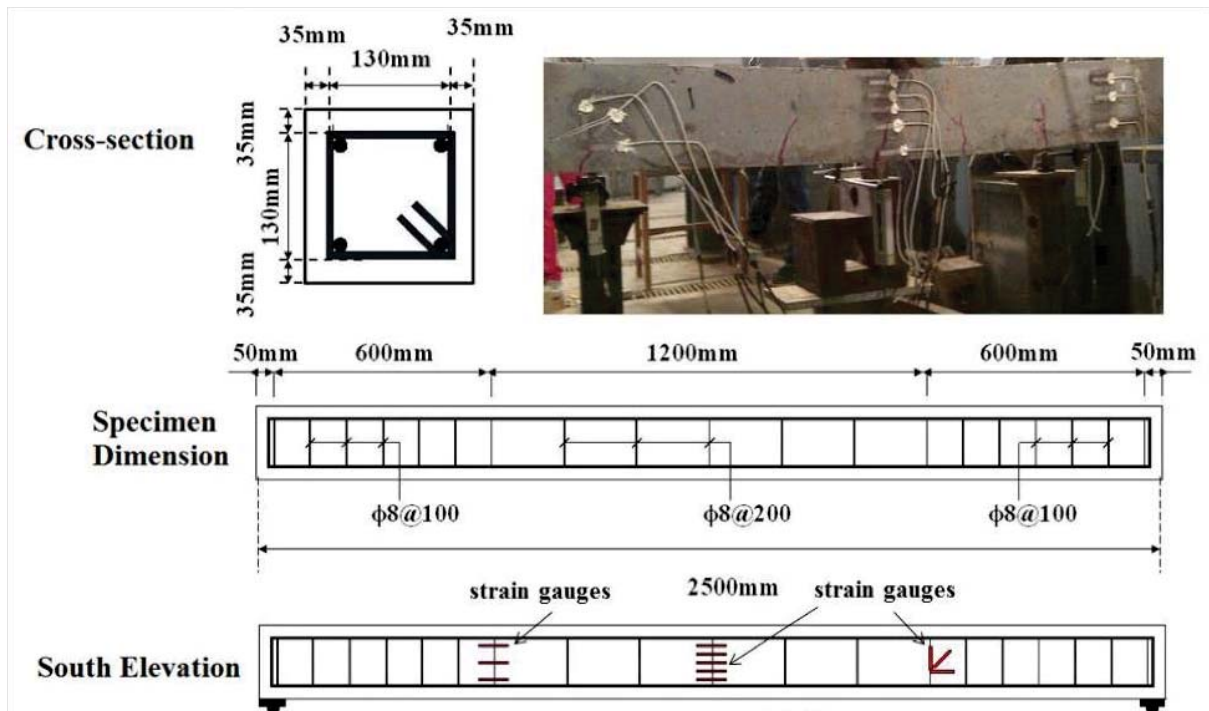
Cross section, column dimension, elevation and instrumentation plan
